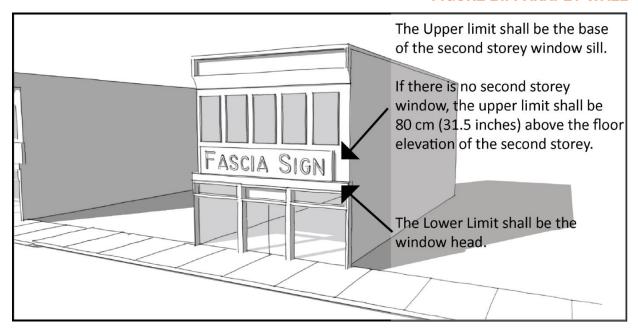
FASCIA SIGN PLACEMENT ON A TWO STOREY BUILDING
